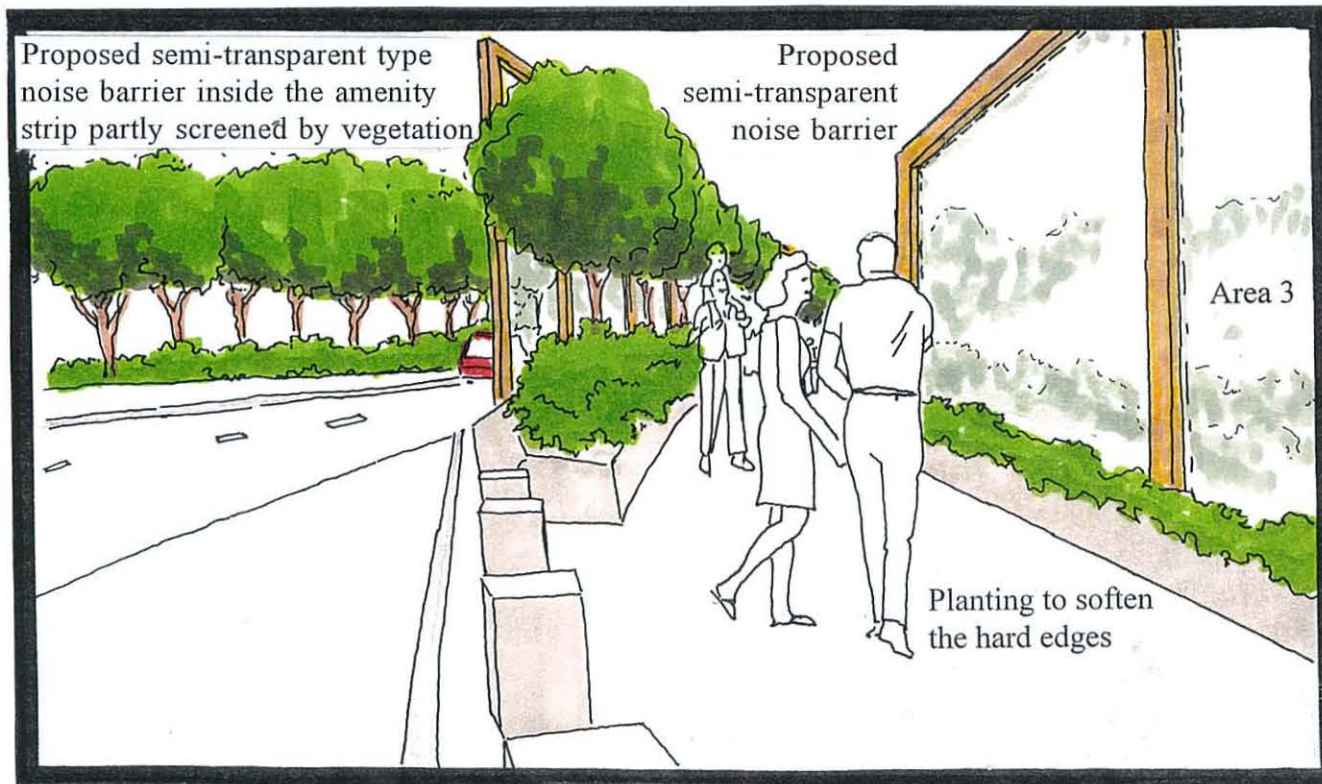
View of the proposed noise barrier along footpath of Ping Ha Road
